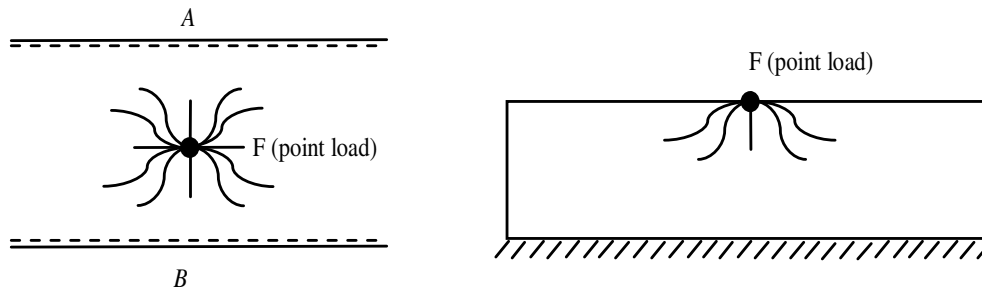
Load distribution of a slab (a) cantilever slab subjected to point load (b) one-way simply supported slab cantilever.
